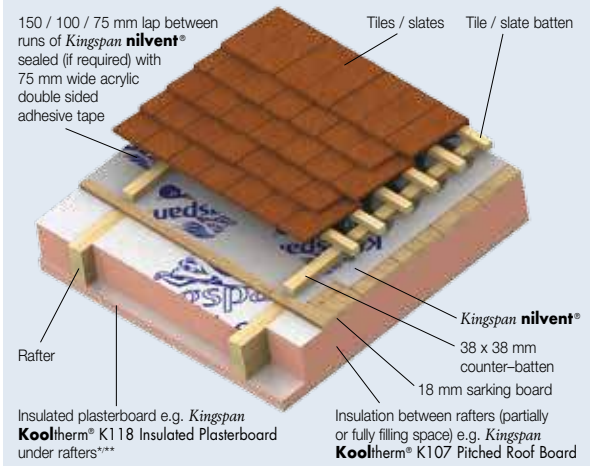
Insulation Between Rafters – Sarking Board – Battens & Tiles
